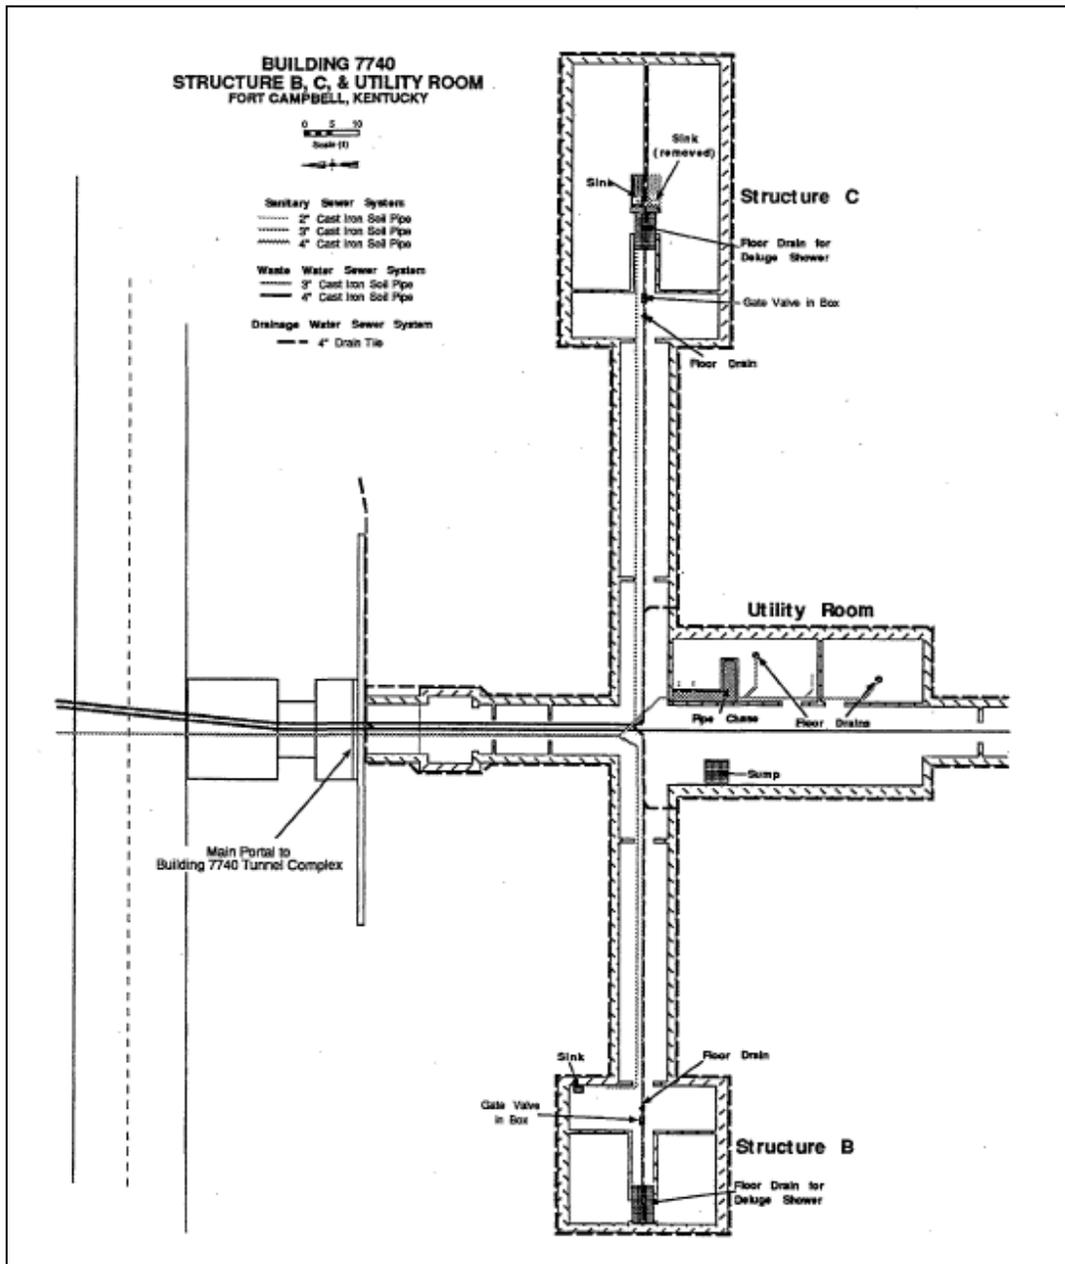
Plan view of the B and C Structures in the tunnel complex.
